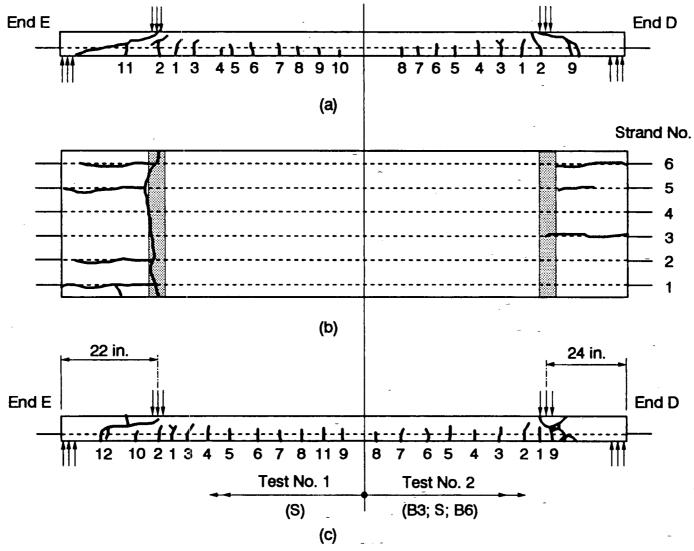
Crack patterns for D-type Specimen No. 14-6.0DC-3:
